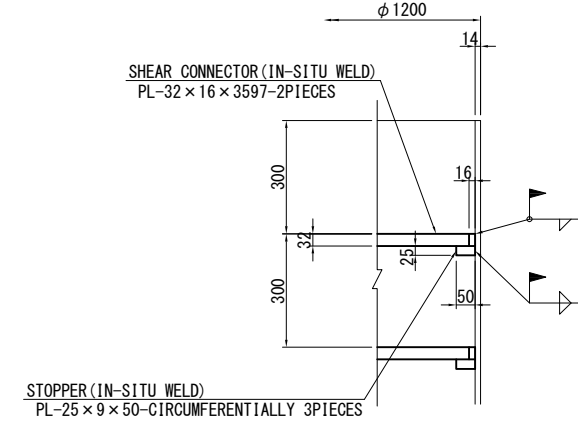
DETAIL OF ATTACHMENT OF SHEAR CONNECTOR
